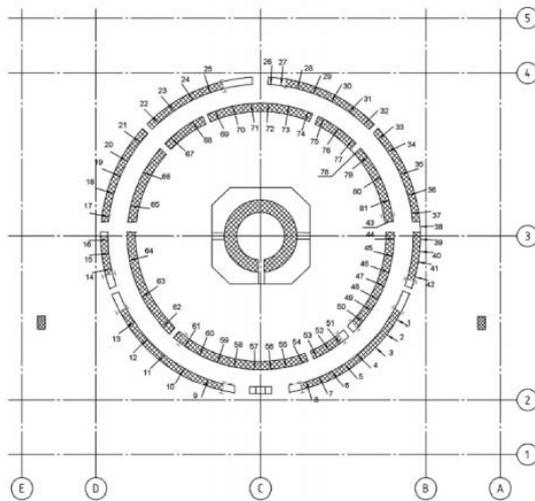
Scheme for inspection the concrete strength in outer and inner annular wall at elevation -5.450m to -1.850m.
